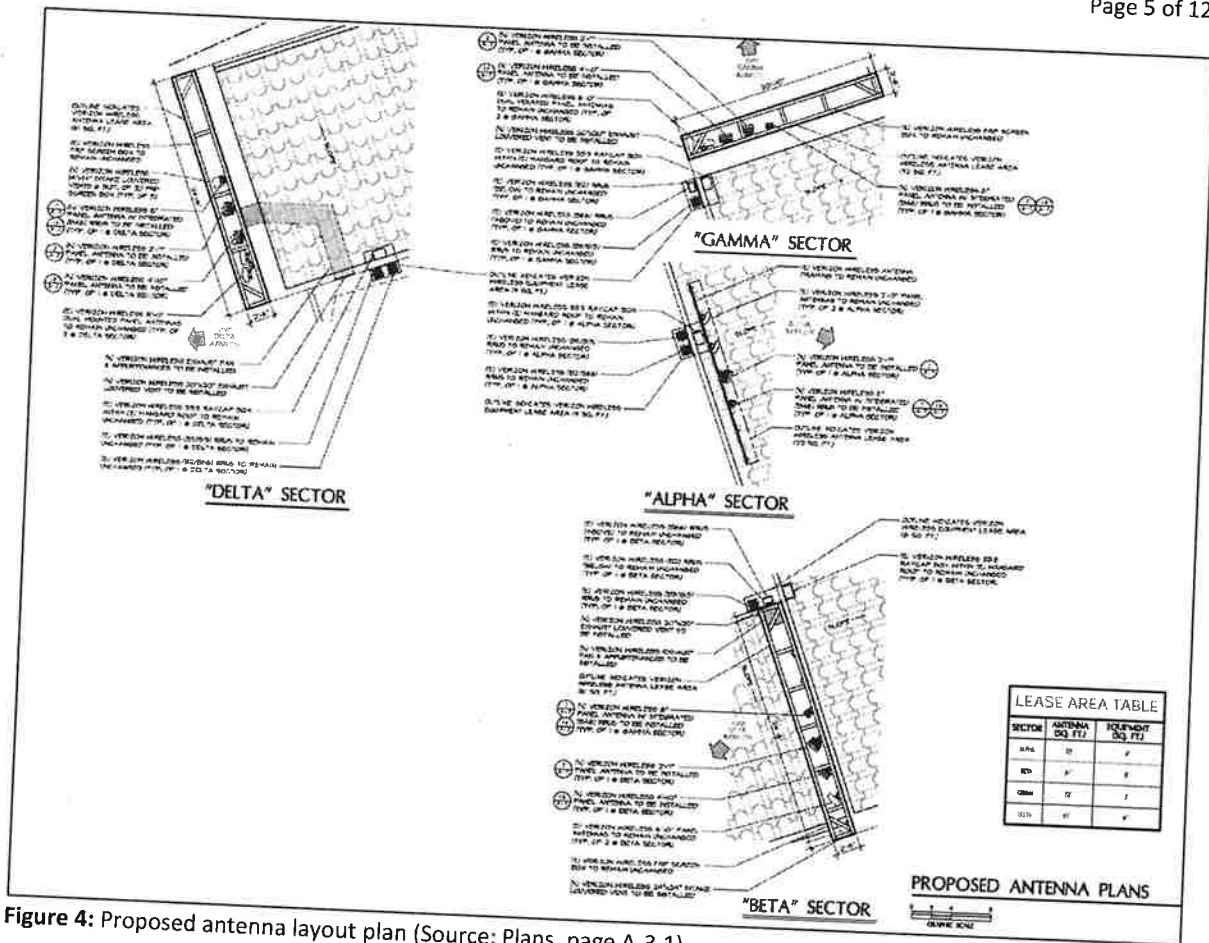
Proposed antenna layout plan (Source: Plans, page A-3.1).
